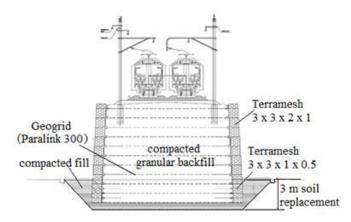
Ba-Soettarail embankment constructed with back to back MSE wall and soil replacement.
